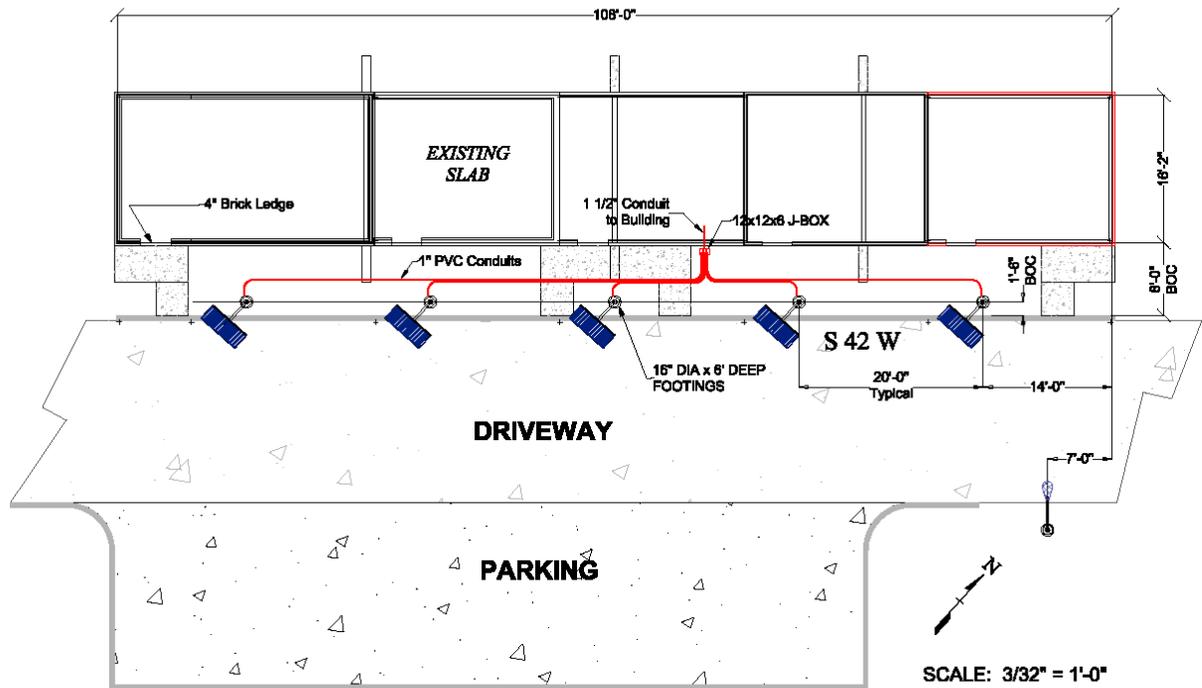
Layout drawing for the location of the light poles, powerhouse, and conduit
